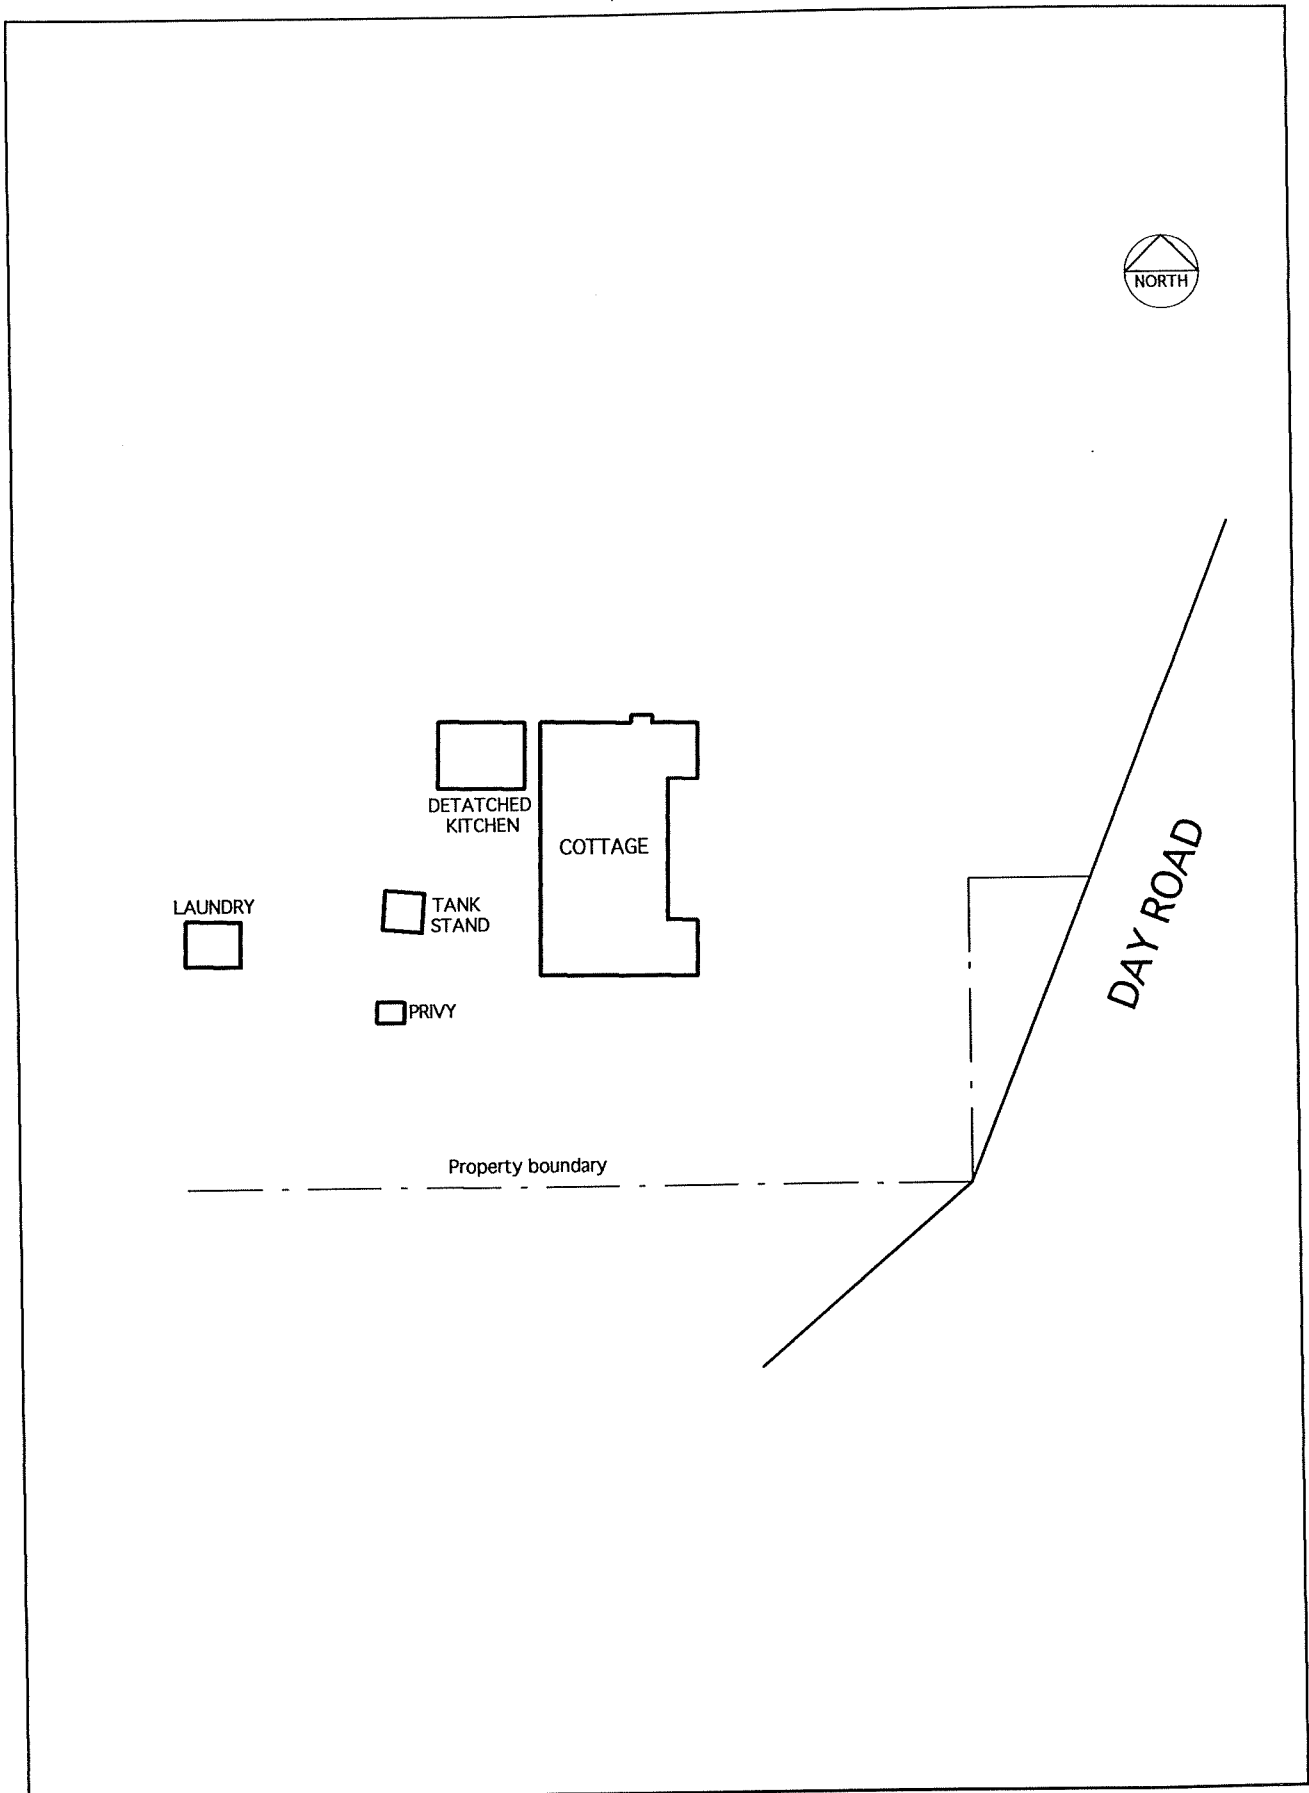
Sketch plan of the place, indicating the features which are the subject of this report.
